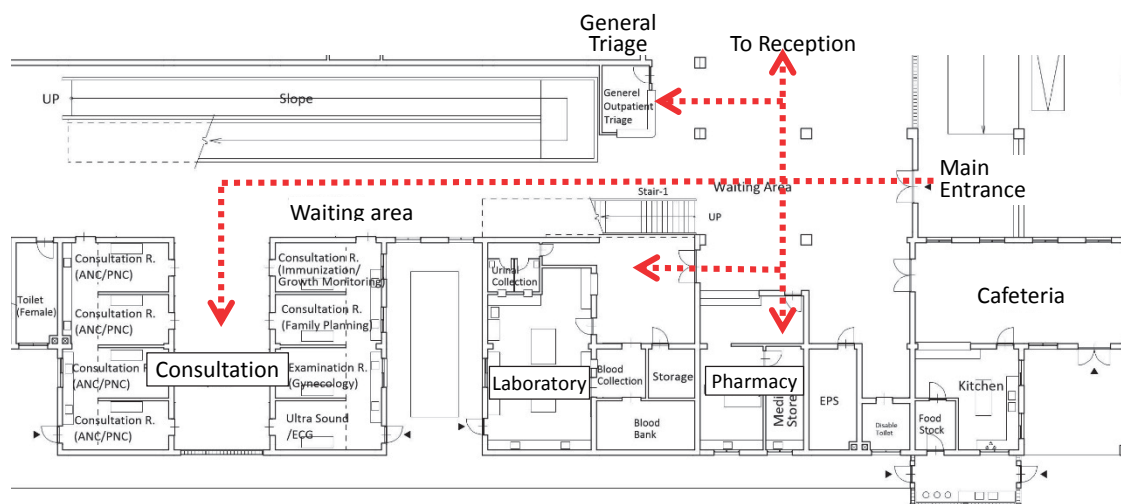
Floor Plan of Outpatient/ Consulting Zone
